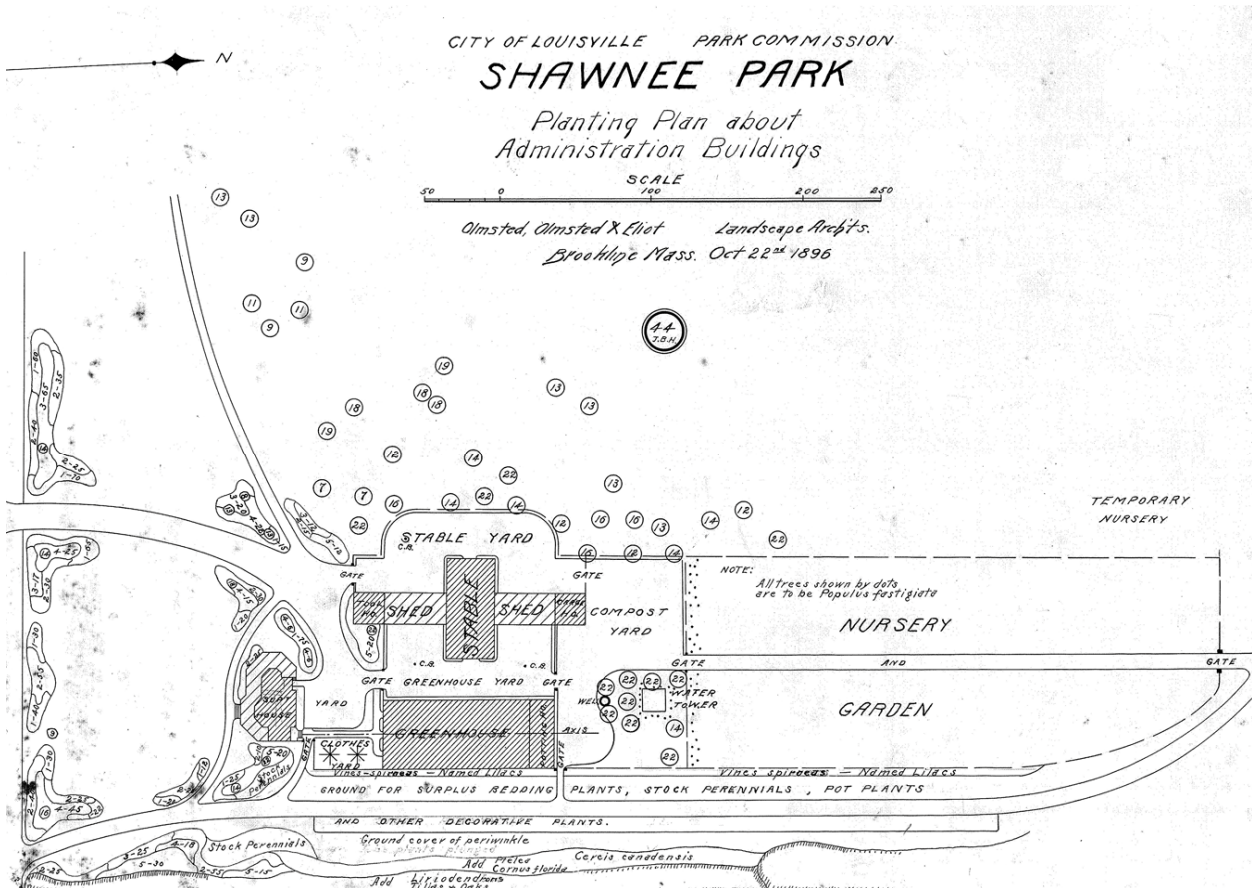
The 1896 "Planting Plan about Administration Building" shows the early design of the Administration area and the existing landscape elements to be incorporated into the newly designed Shawnee Park. Olmsted utilized existing trees and landscape features within his design. Courtesy of FLONHS. (R-SPU-FLONHS-01269-7-PrelimPlan44-22Oct1896)
